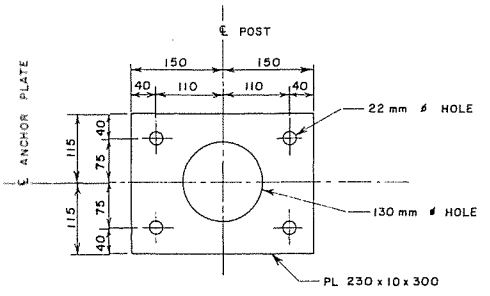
DETAIL "B" (SIMILAR TO DETAIL "A" EXCEPT AS NOTED).
